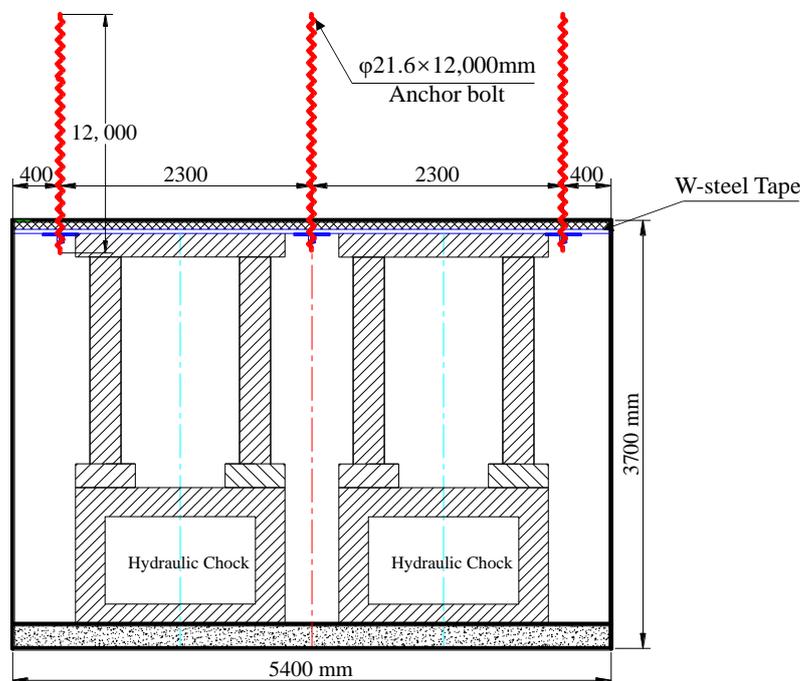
Schematic diagram of roof reinforcement and support of main retracement roadway.
